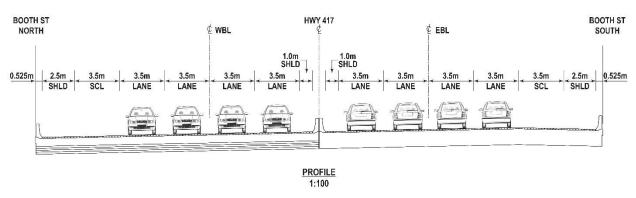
Proposed Booth Street Overpass Cross-Section
